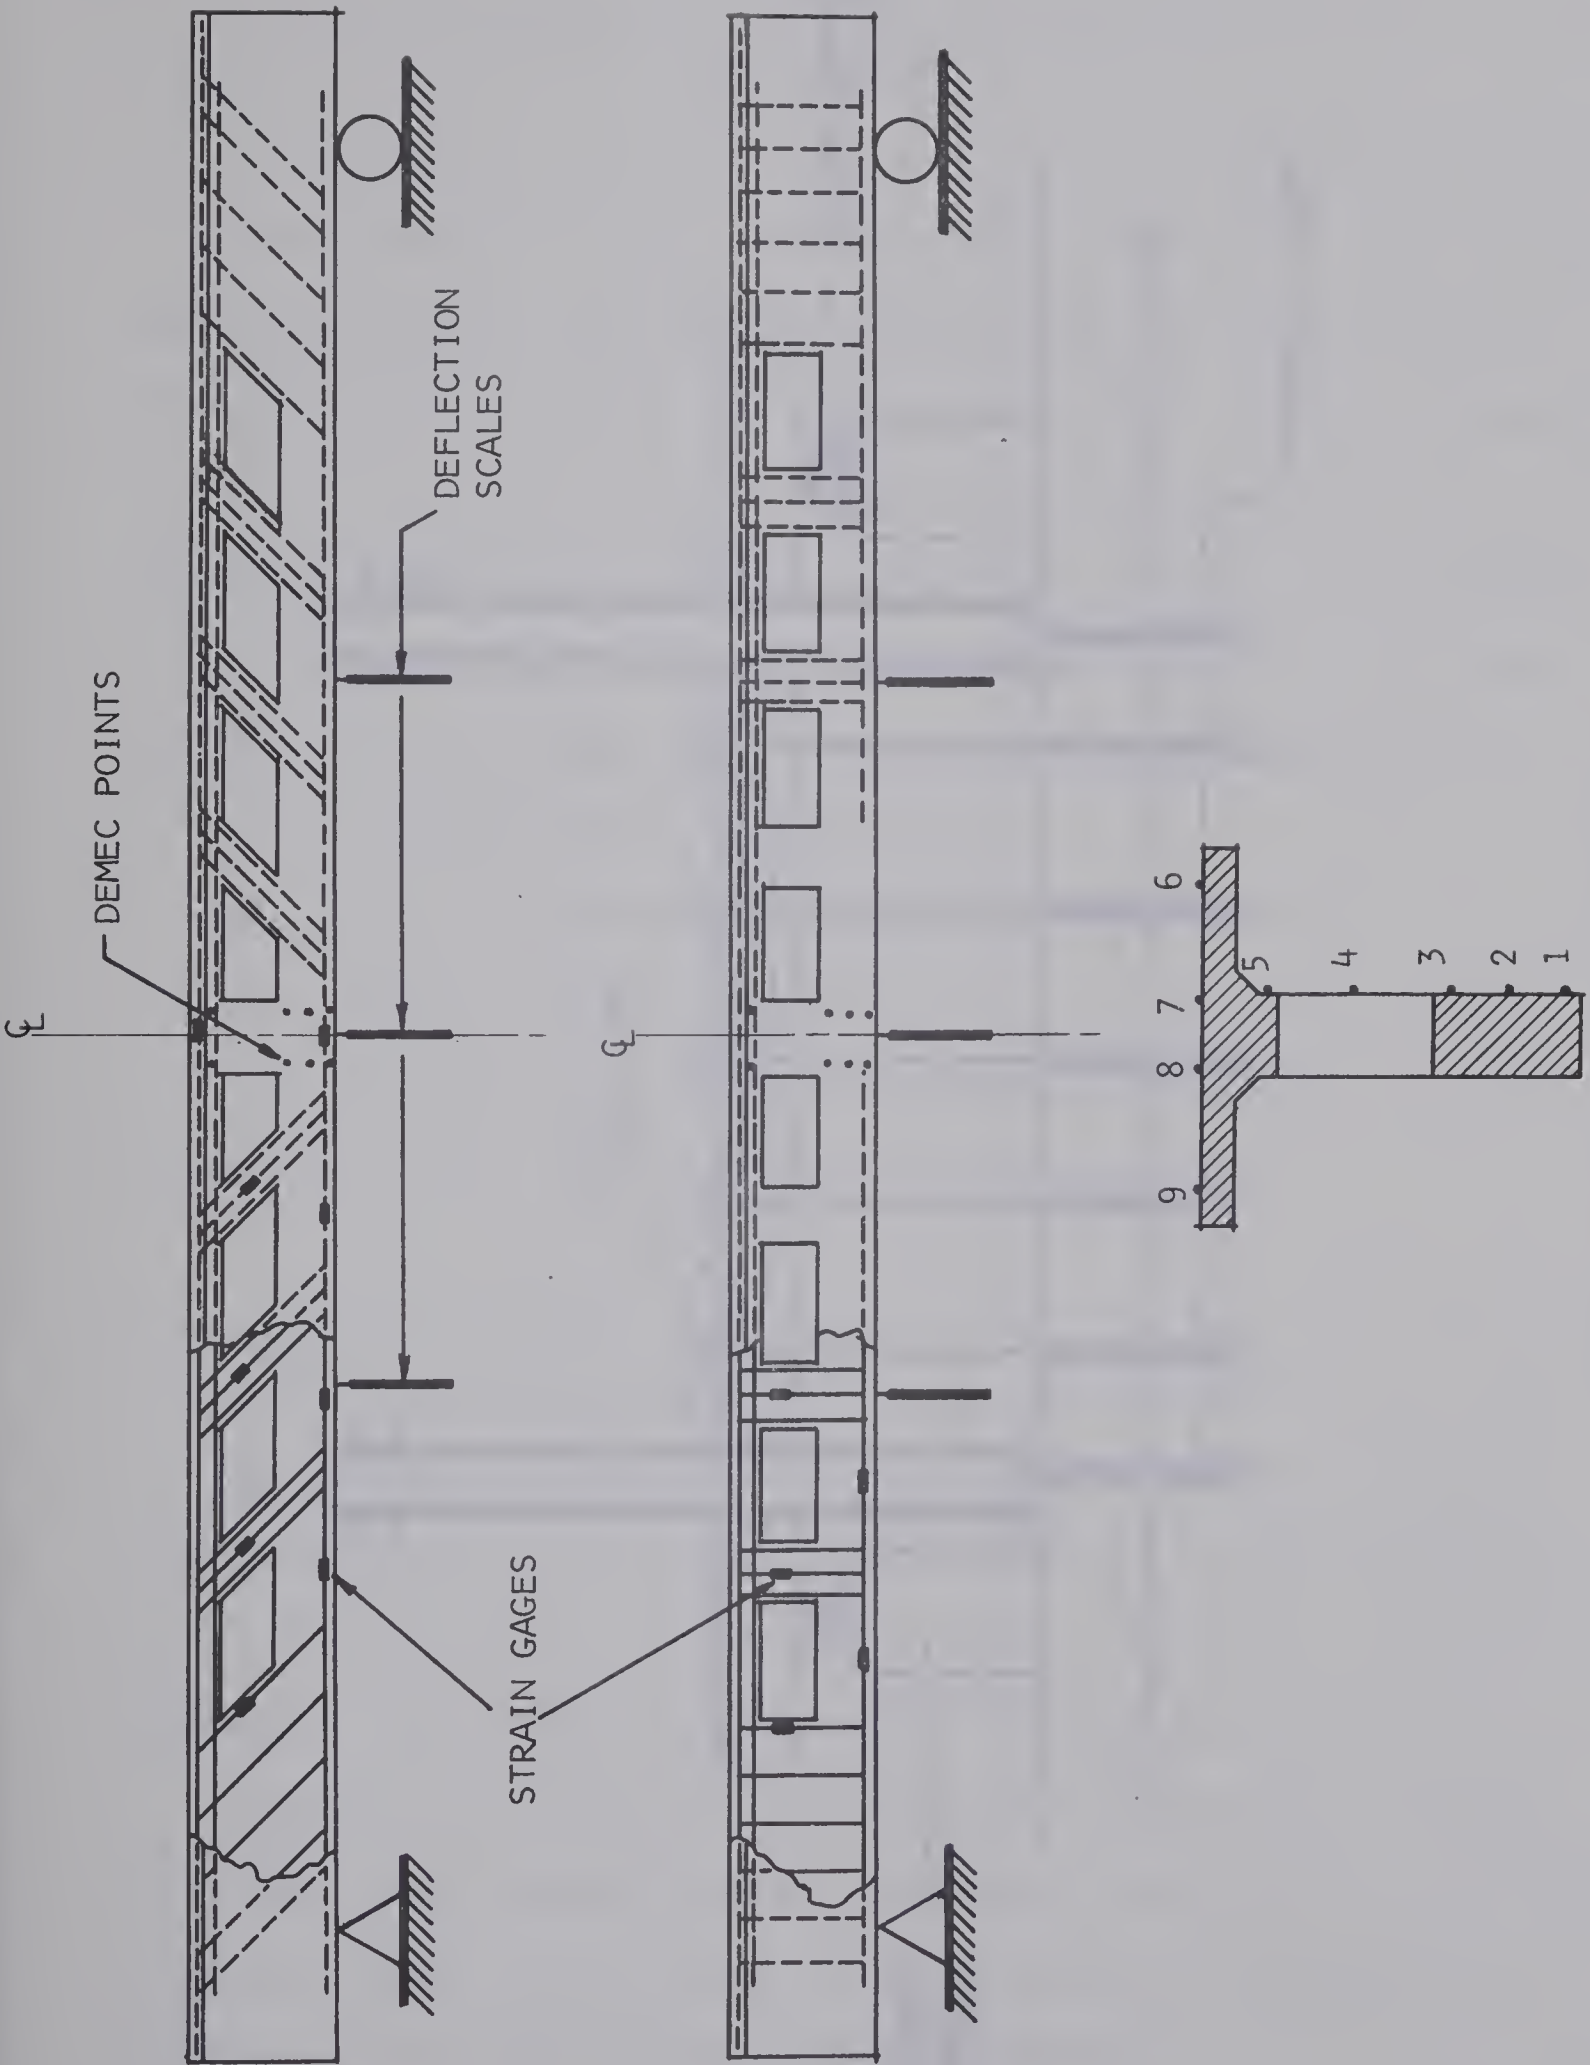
BEAM INSTRUMENTATION DETAILS AND LOCATIONS
